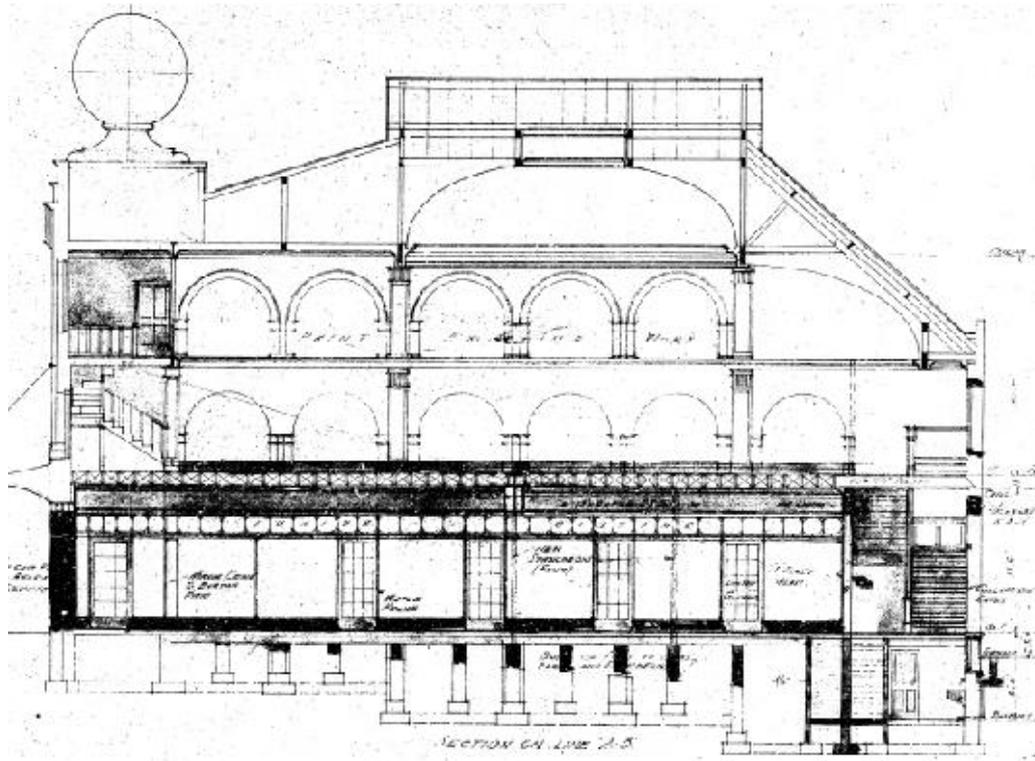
Extract of the 1925 section drawing of the Centreway Arcade
